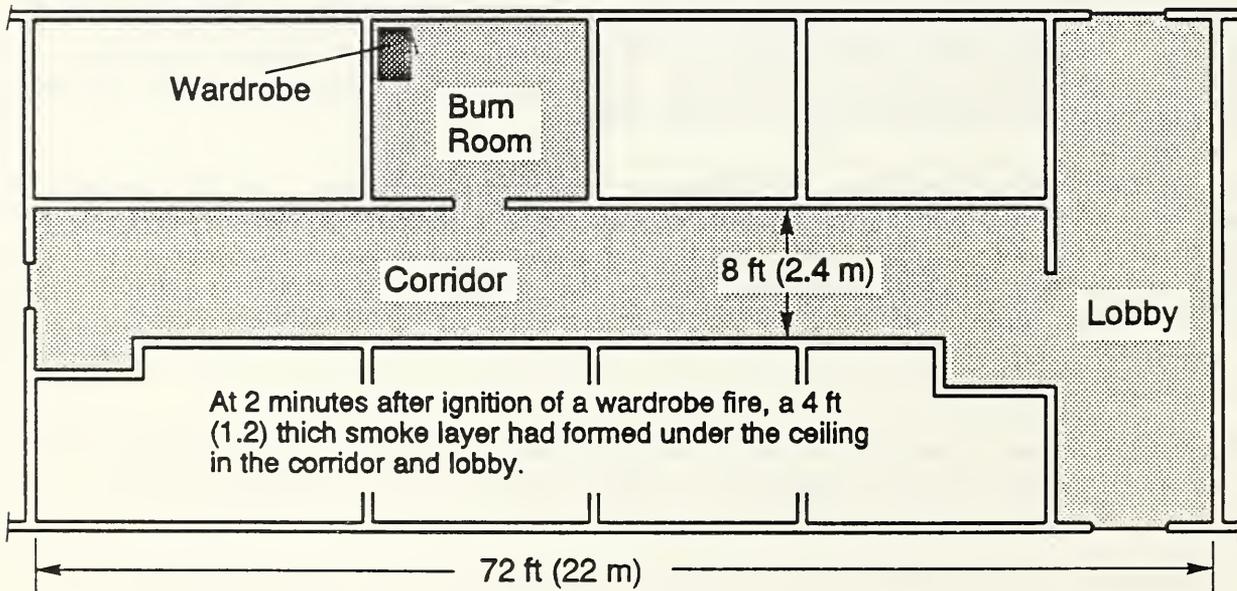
Floor plan of the Health Care Test Facility at the NIST Annex
